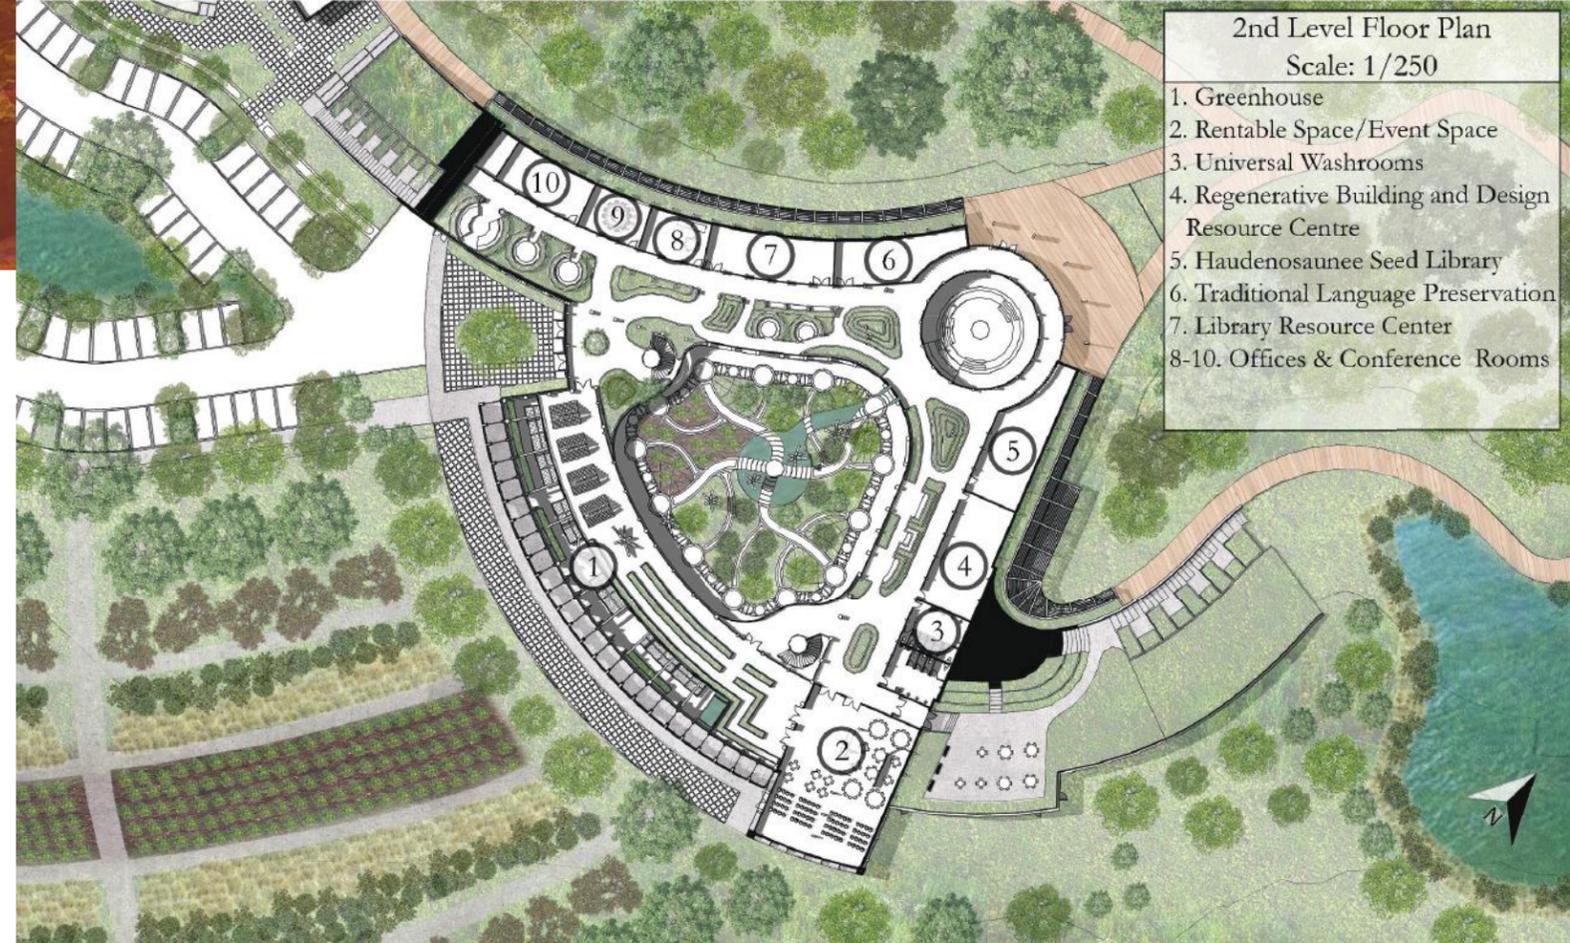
Second floor plan of the Land Based Learning Facility produced by author.
